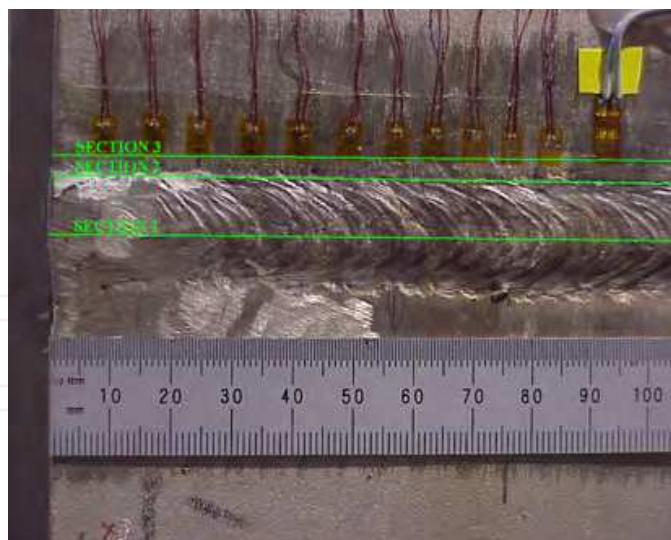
Groove weld area on flange of the groove welded beam (outer surface)
